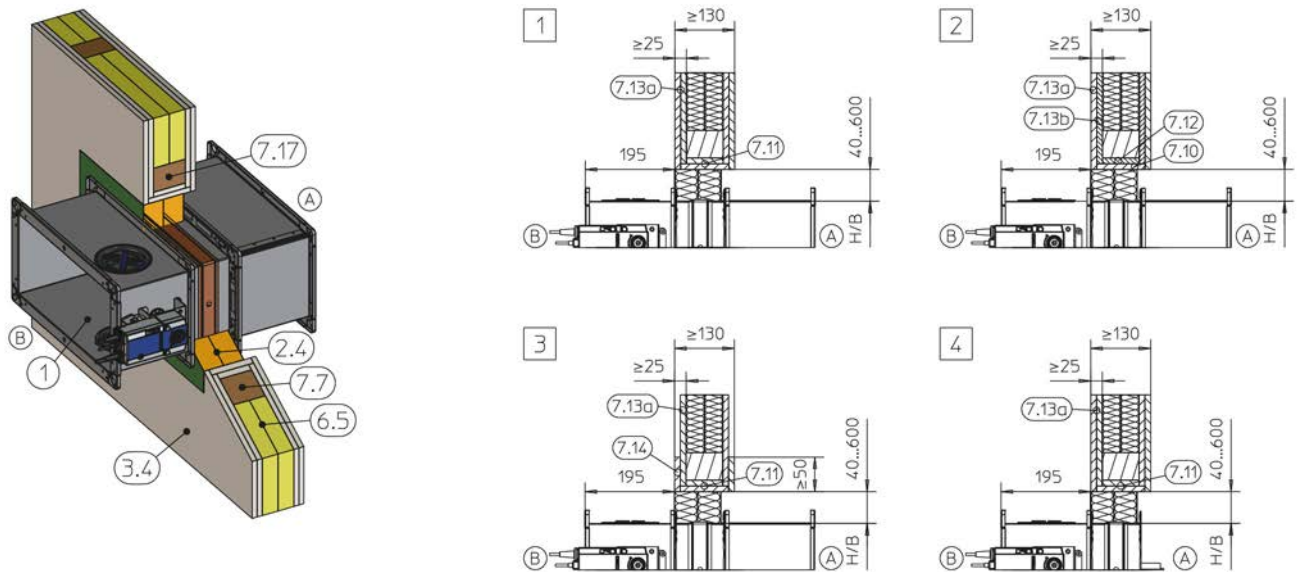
Dry mortarless installation into a half-timbered construction, with installation kit ES
